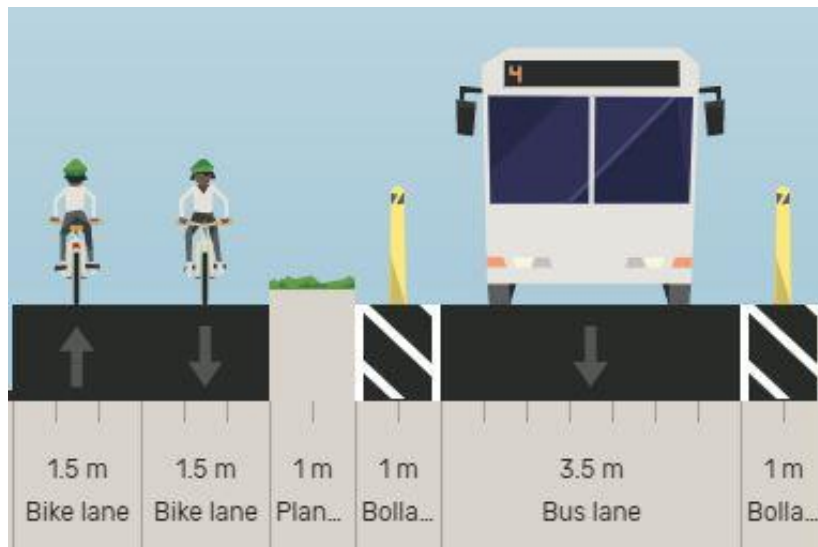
Indicative cross section BRT (9.5m single carriageway)
